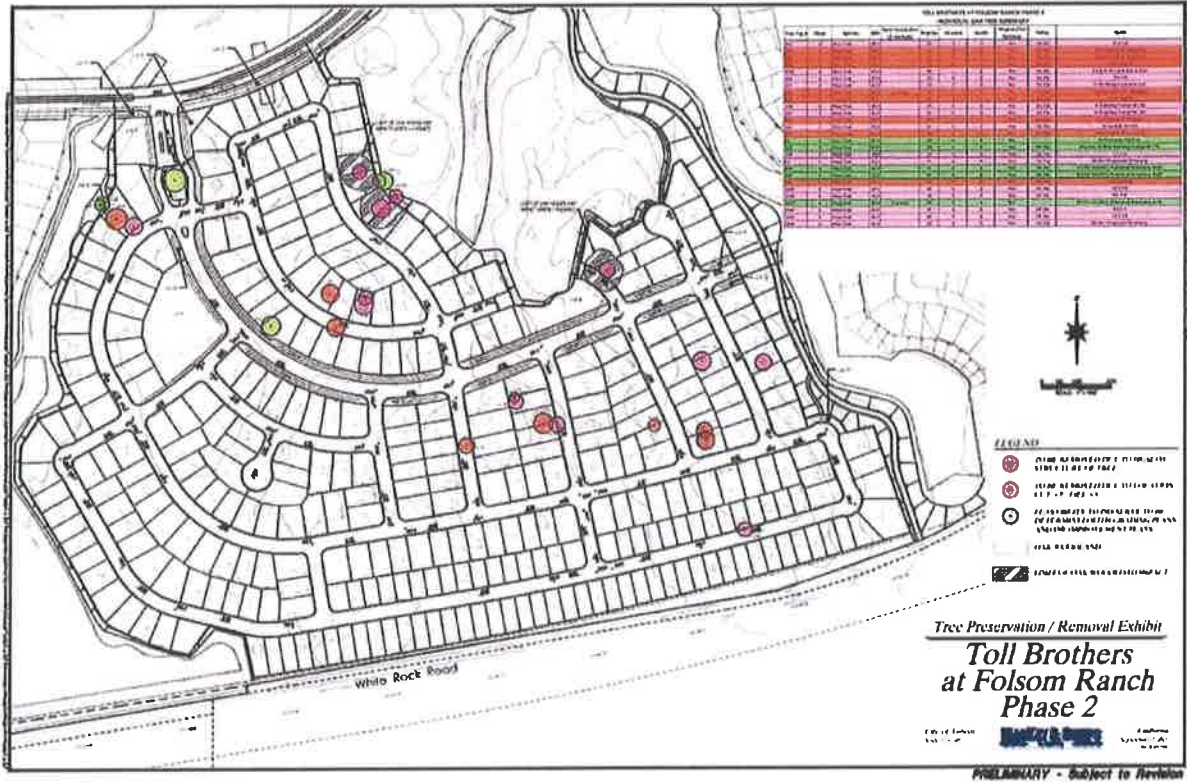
TREE PRESERVATION/REMOVAL PLAN
